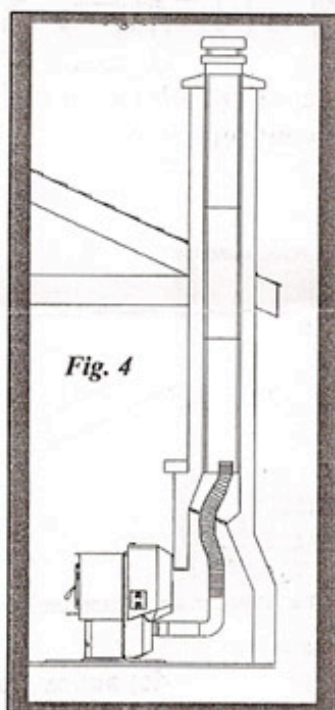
Venting in a masonry fireplace terminating into the first tile liner
